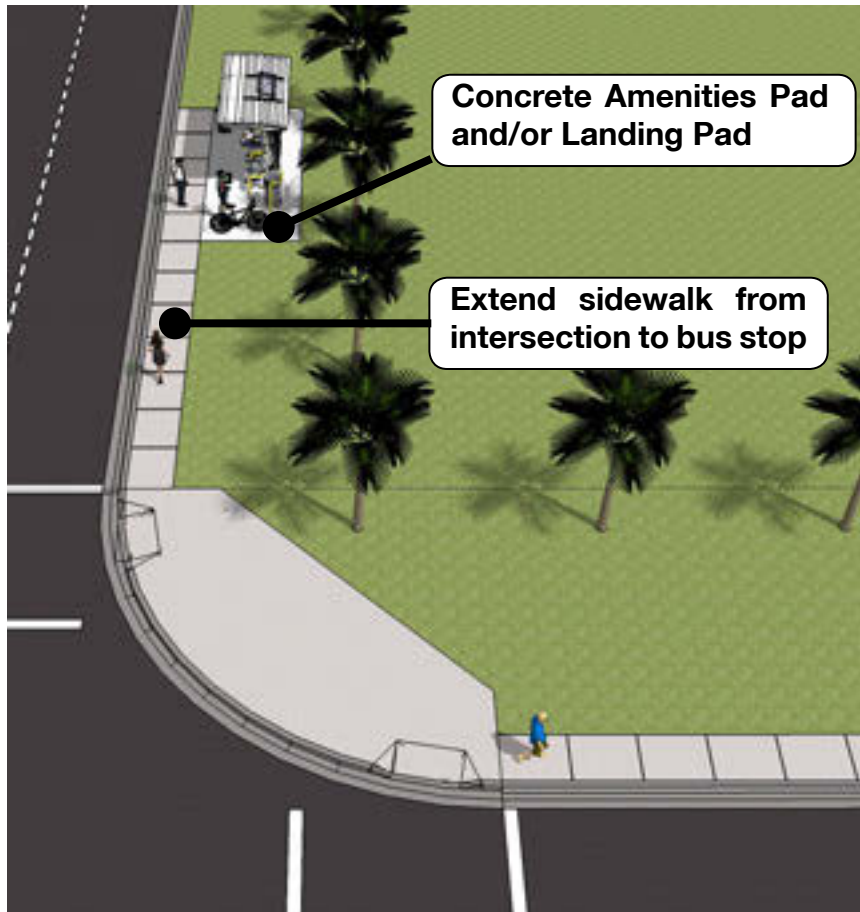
Patron Access - ADA Compliant Layout
